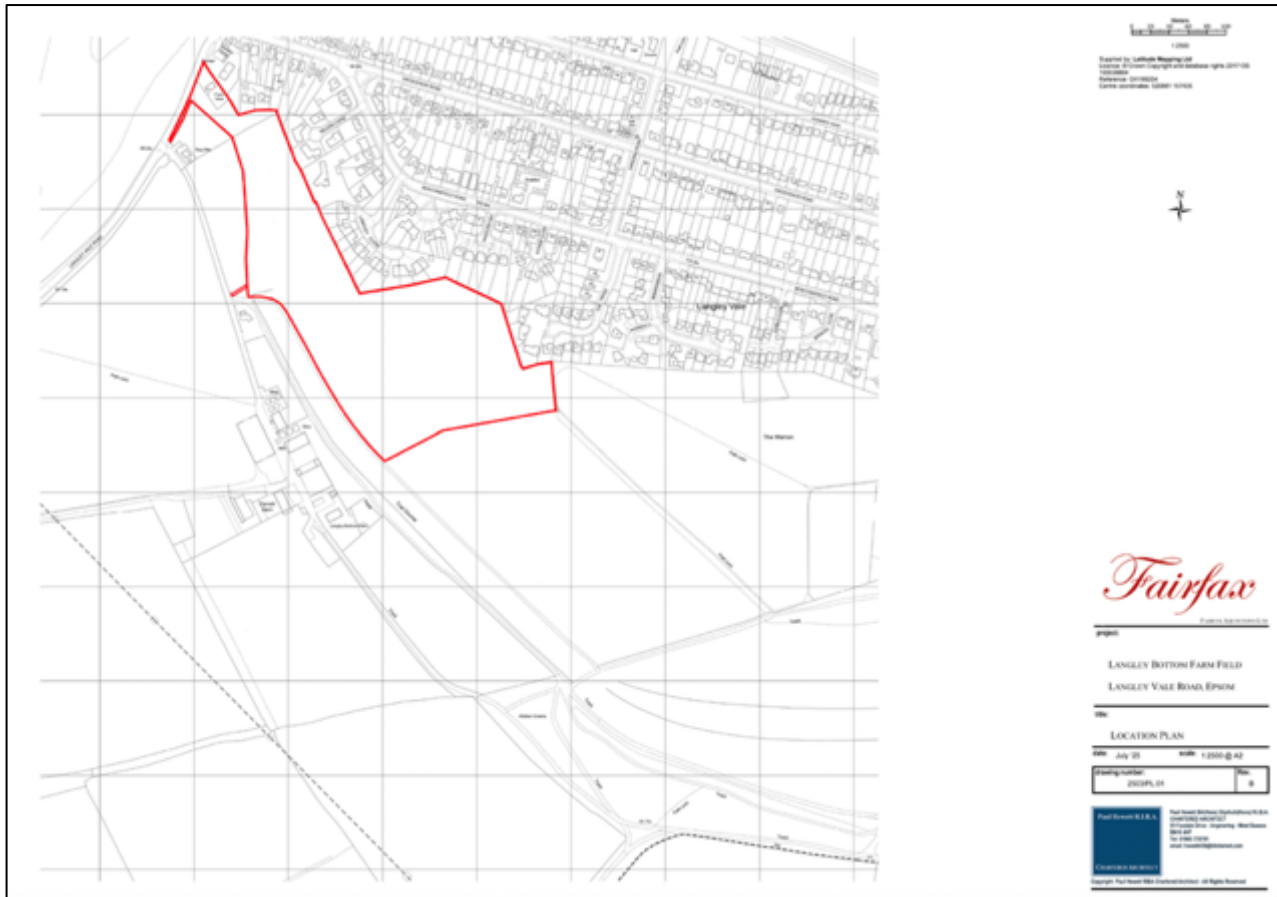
An aerial image showing the location of the site. The approximate construction site boundary is outlined in red. Replicated from Location Plan produced Paul Hewitt RIBA Chartered Architect (Drawing Number 2504/PA.01).
